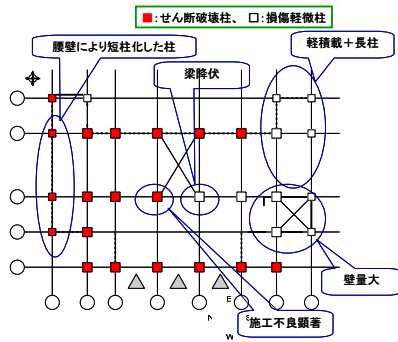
Ground Plan of 1st Story of Story-Collapsed Building in ISI
